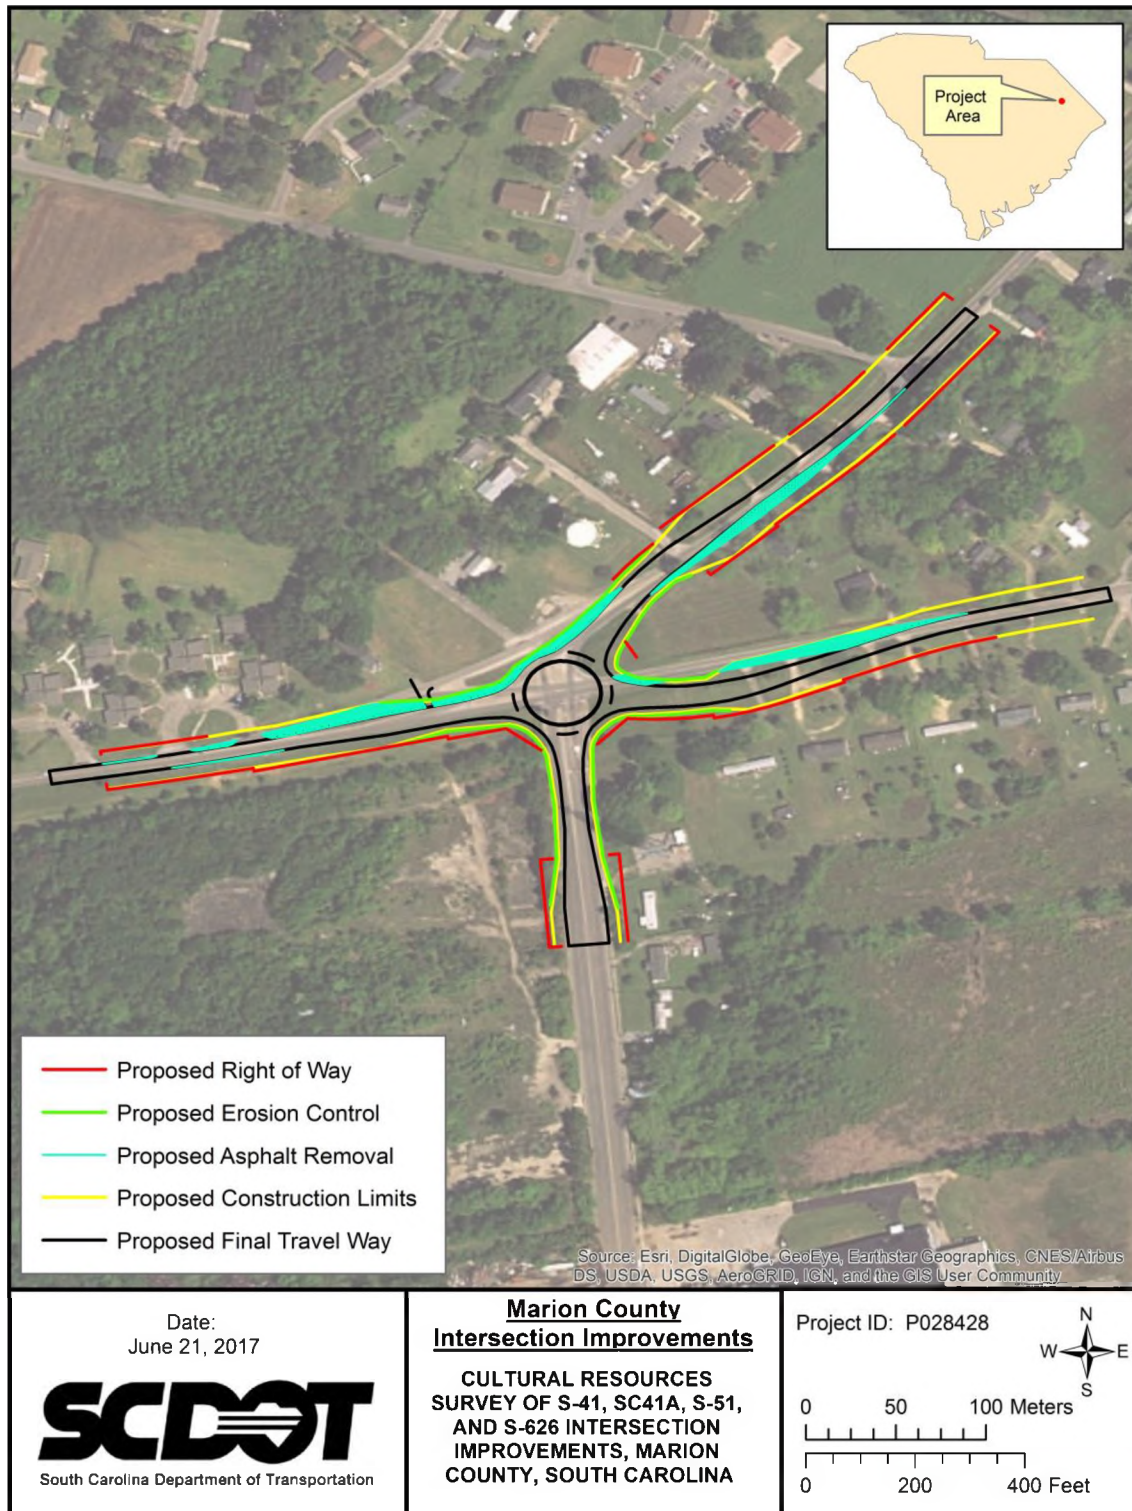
S-41, SC-41A, S-51, and S-626 Intersection Improvement Project Plans.
